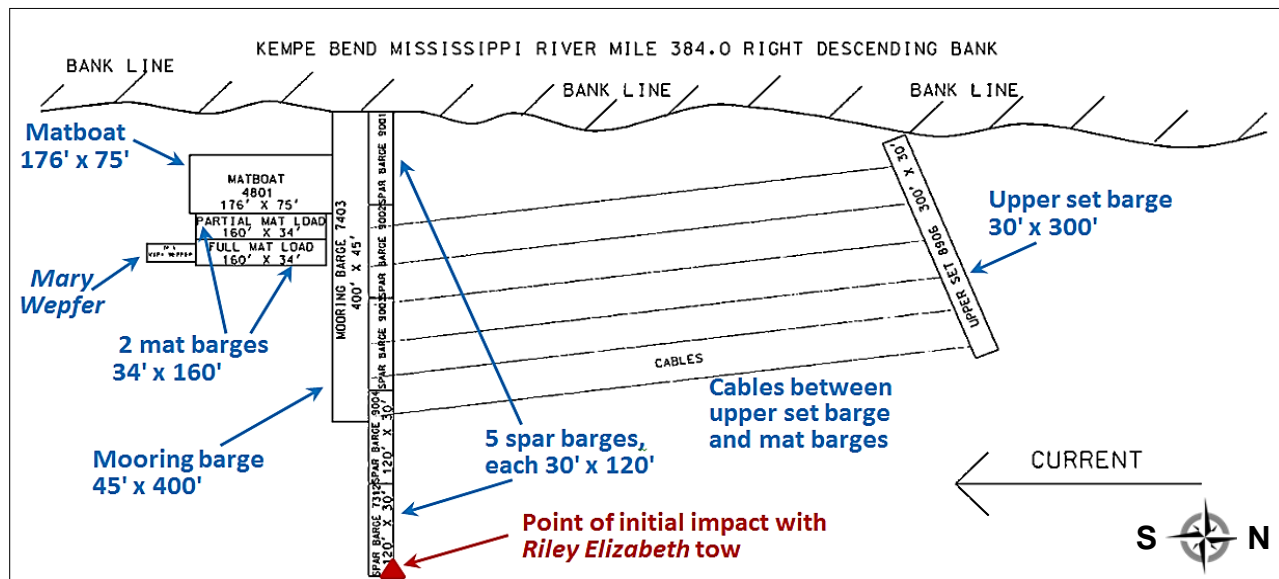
Excerpt from a Corps of Engineers drawing, created after the accident, depicting the layout of the barge plant as if seen from above. (Image provided by the Corps of Engineers) Also see figures 8 and 9.
